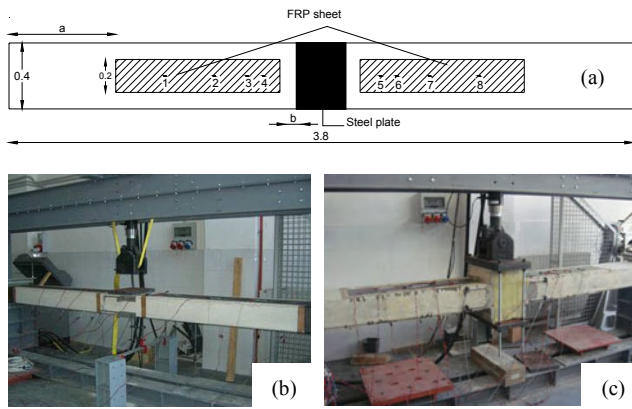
a) Strengthening scheme; b) Testing configuration of beams A1-A2; c) Final testing configuration for beams A3-A4
